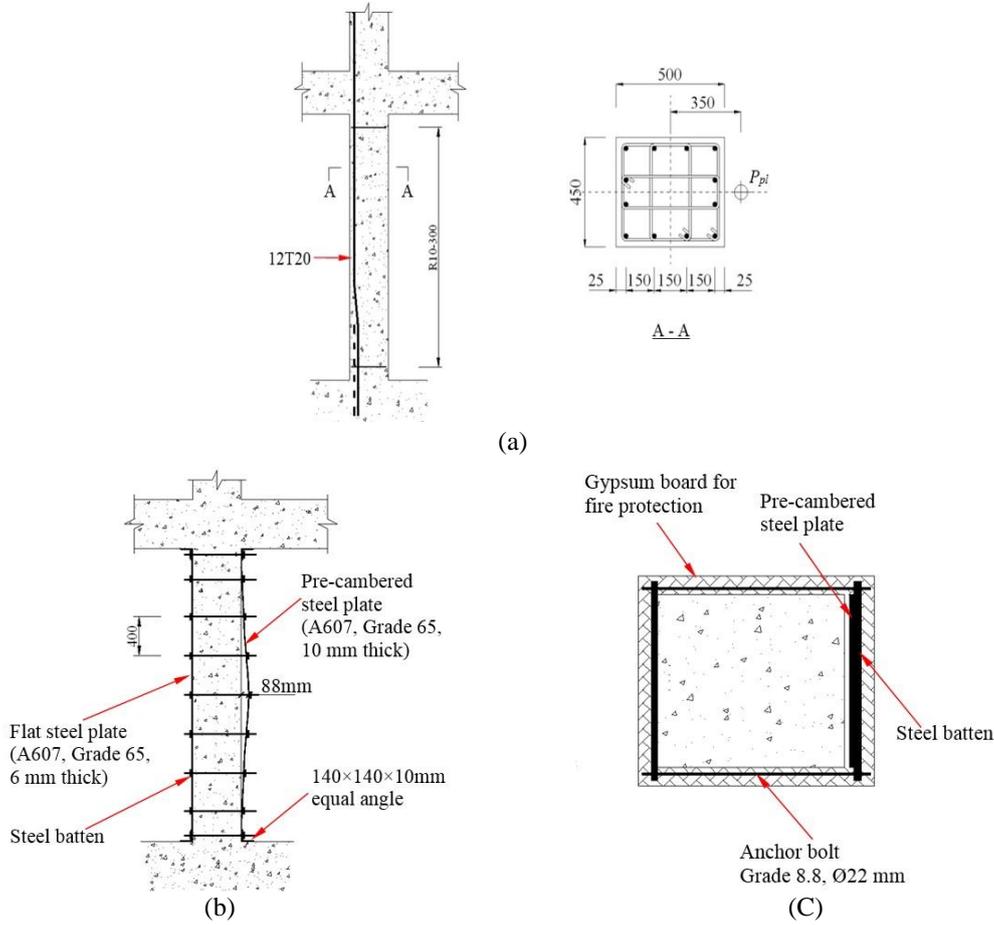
Worked example (a) column details, (b) strengthening details and (c) batten details
